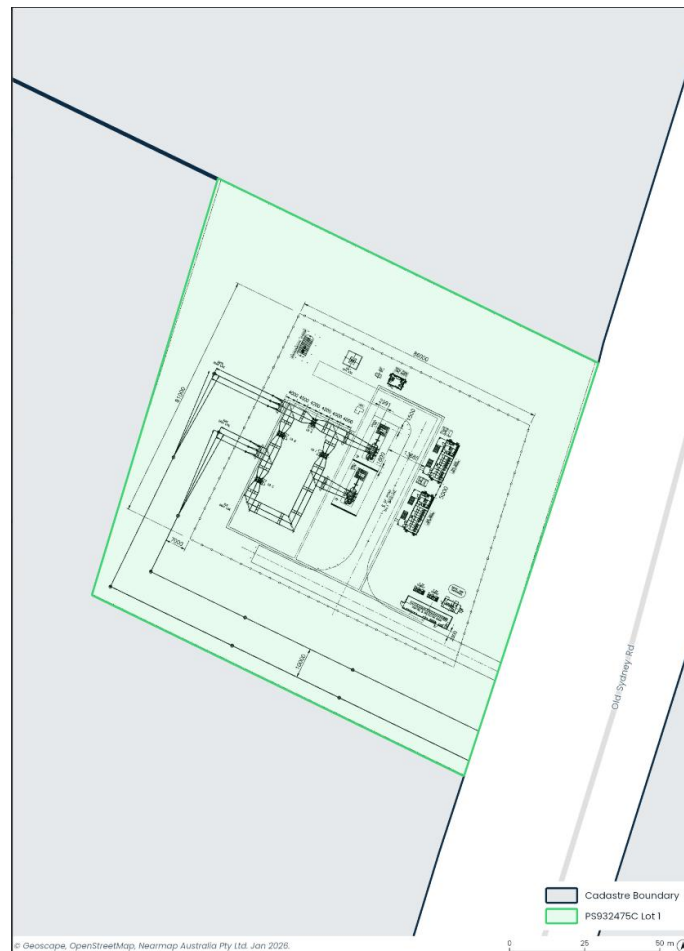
Overlay of the Site Layout Plan and Proposed Plan of Subdivision (Source: Decision Plans)
